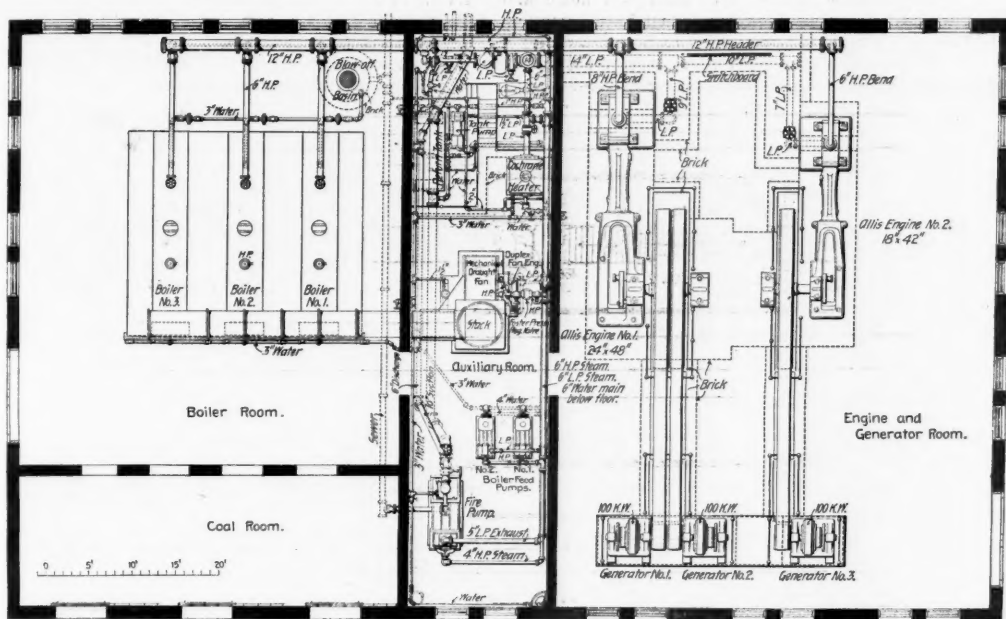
General Arrangement of Machinery and Piping Systems in Power House—Wisconsin Central Shops, Fond du Lac, Wis.
